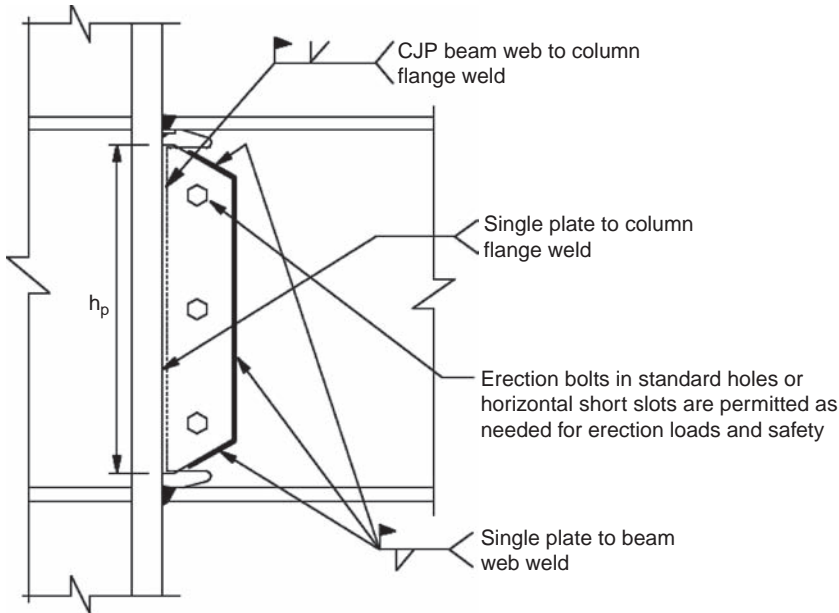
WUF-W beam-to-column connection (from AISC 358). (Copyright © American Institute of Steel Construction. Reprinted with permission. All rights reserved.)
